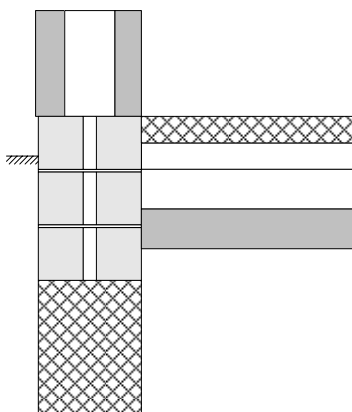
Section of a joint between the outer wall/foundation/slab-on-ground with three insulated lightweight concrete blocks in the foundation
